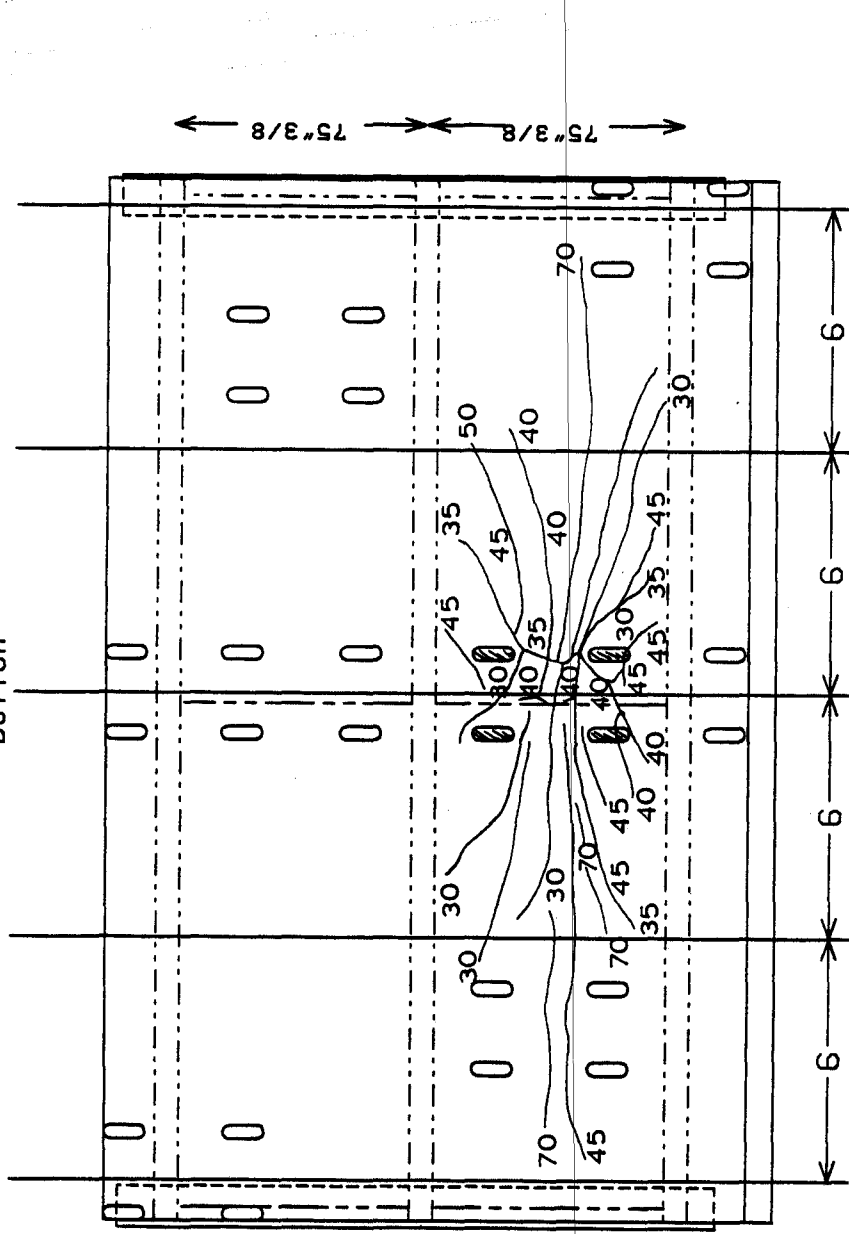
Bottom Cracking Pattern (Second Bridge - Test No. 3)
